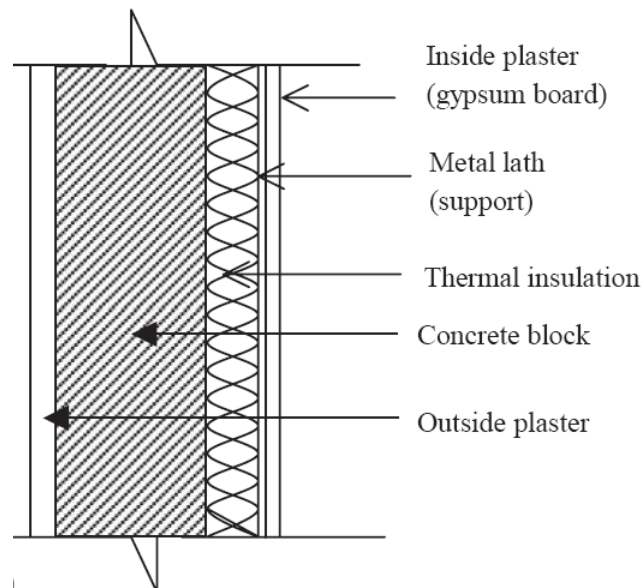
Internal insulation of single-leaf wall covered by a gypsum plasterboard (Al-Homoud, 2005)
